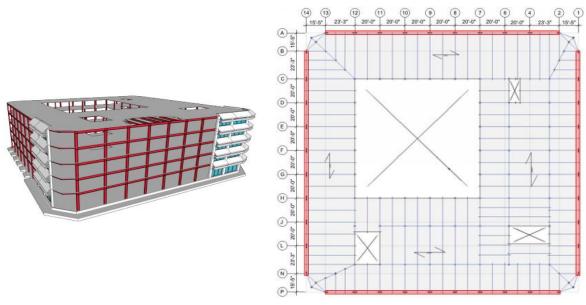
Three-Dimensional View of the Steel Moment Frame Building and Typical Floor Plan
